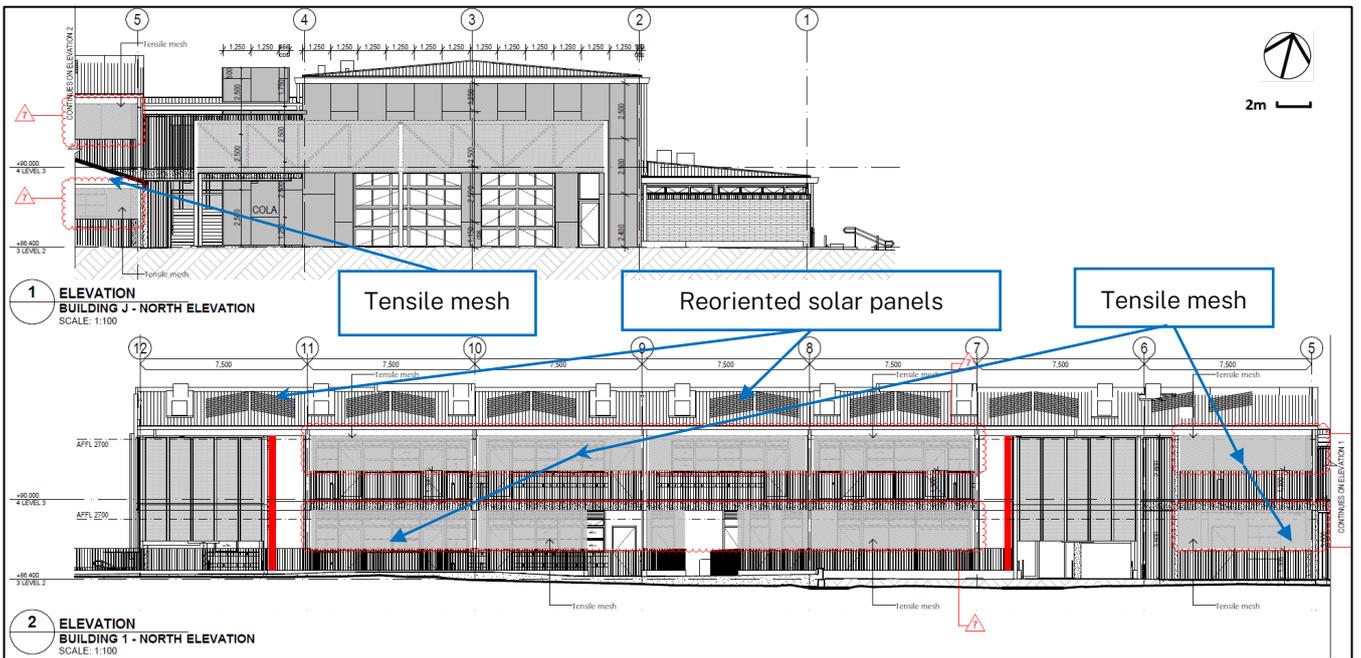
| Modifications to Building I and J north elevation (Base source: Modification 3, 2023)
